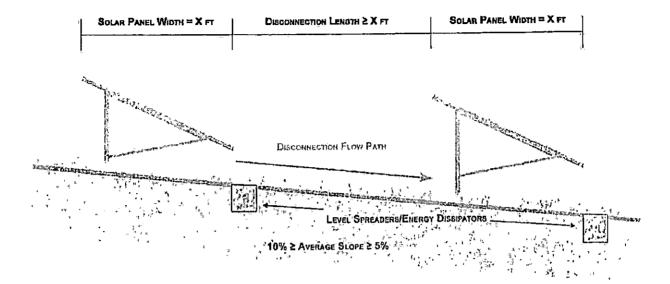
, Typical Installation - Slope ≥ 5% but ≤ 10%
